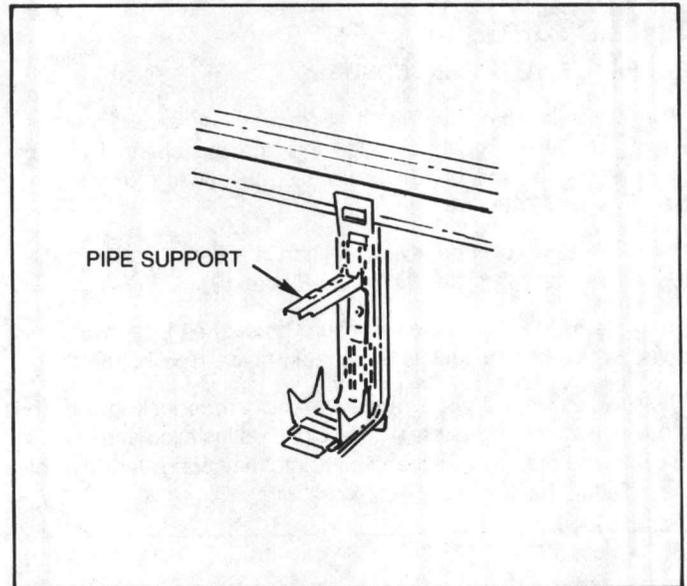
Enclosure Bracket with Pipe Support Installed
